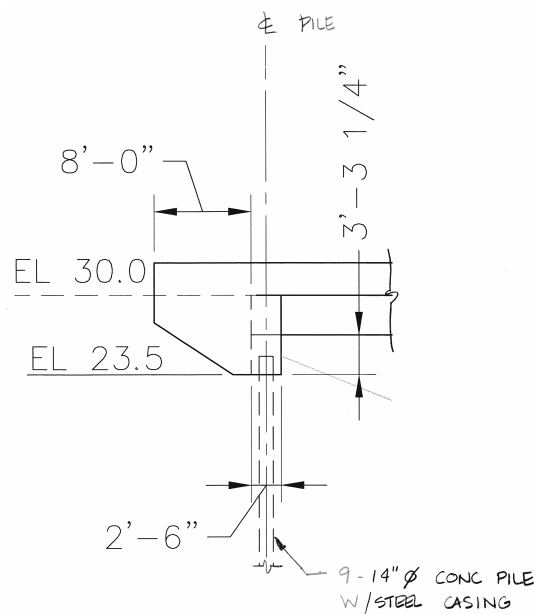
Elevation of Integral Abutment, Missouri Bridge
